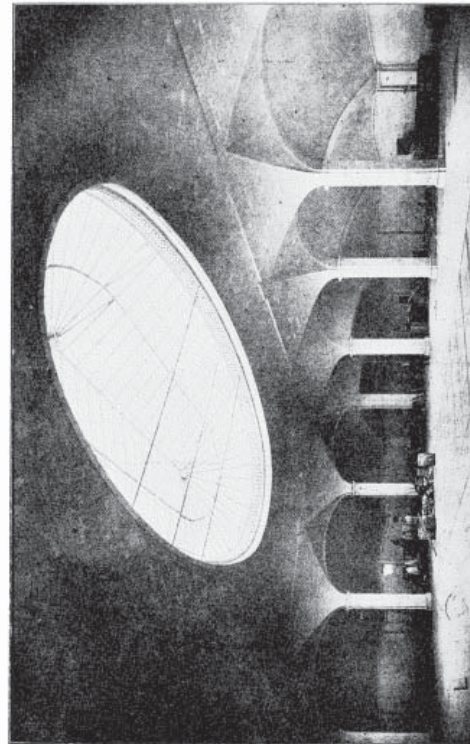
INTERIOR OF THE EXHIBITION ROOM, CORNER OF THE TRINITY BUILDING, NEW YORK CITY. GUASTAVINO SYSTEM. EXHIBITED IN EXHIBITION BUILDING.
